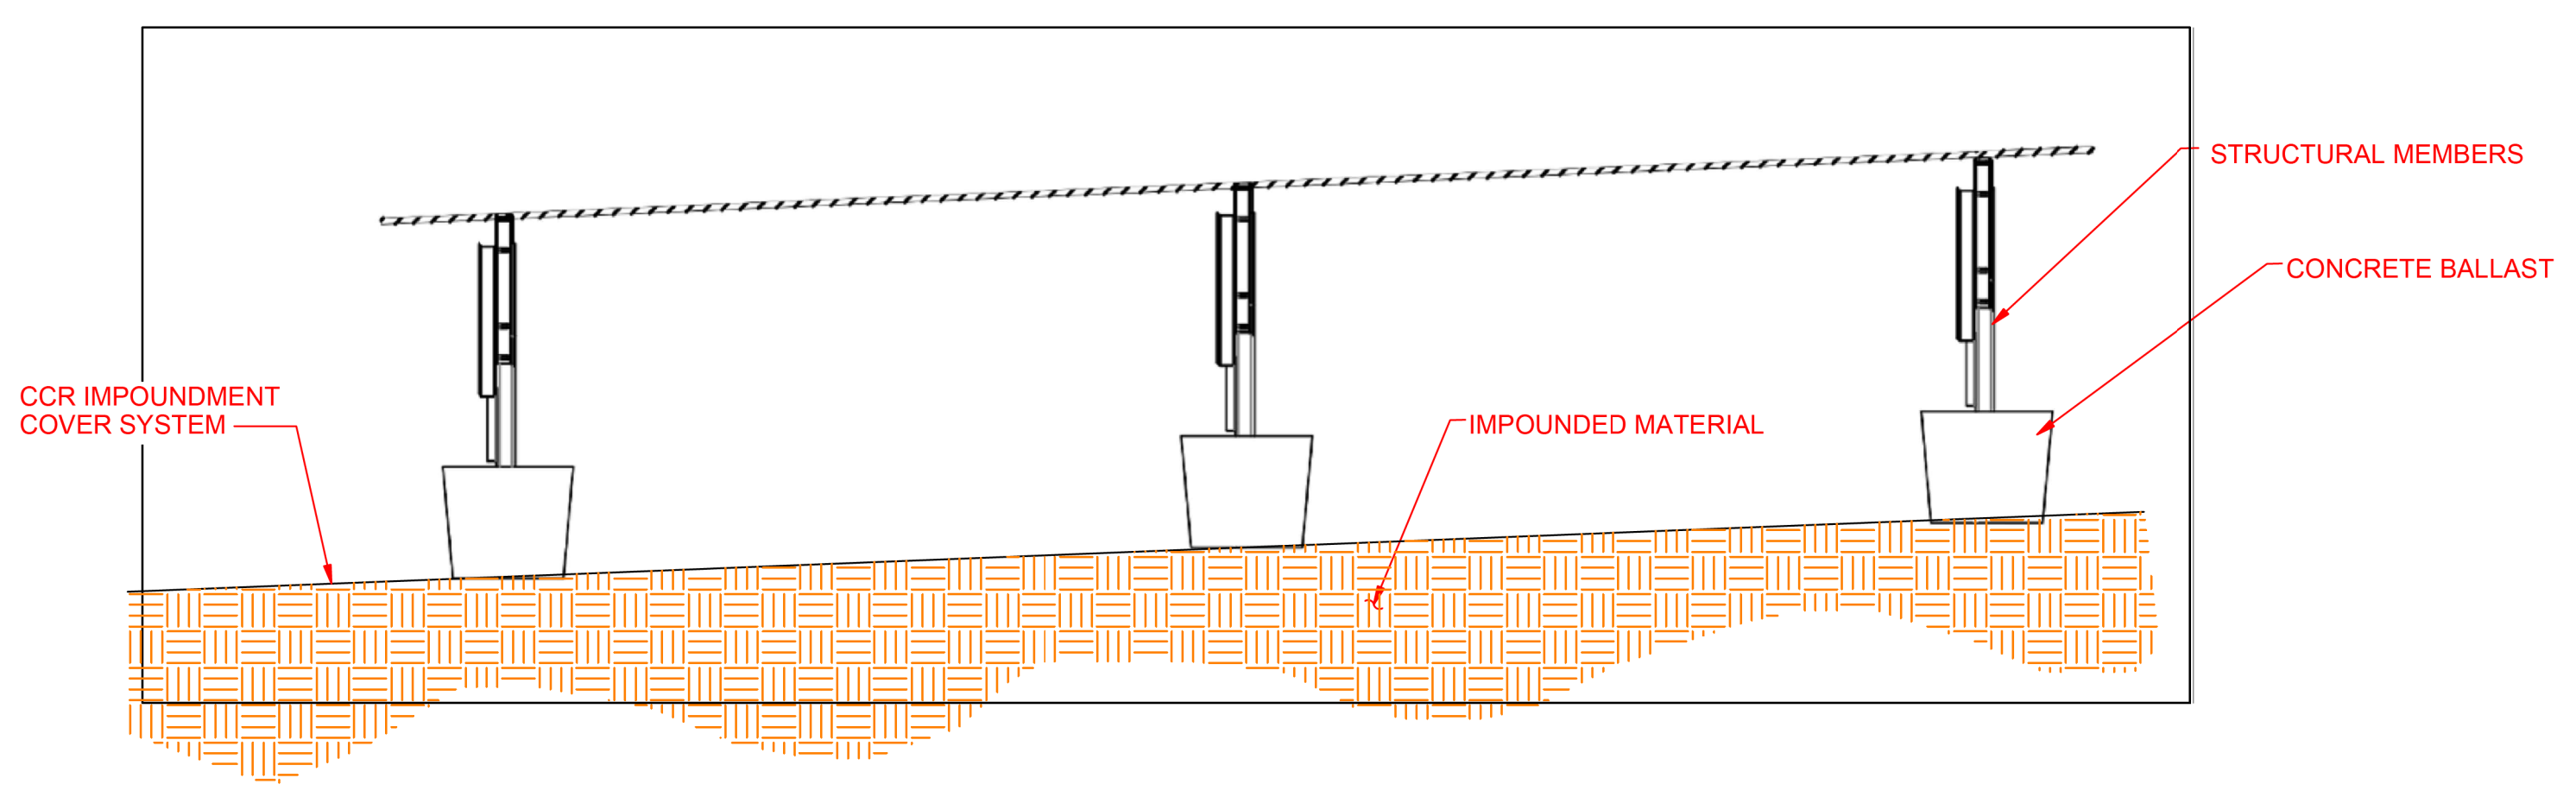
TYP. FIXED TILT BALLAST RACKING
